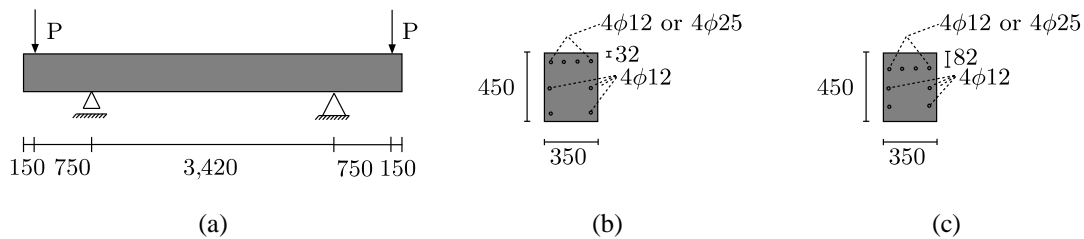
(a) Set-up; cross-section for specimens: (a) 12-20 and 25-20; and (b) 12-70 and 25-70 (all dimensions in mm).
